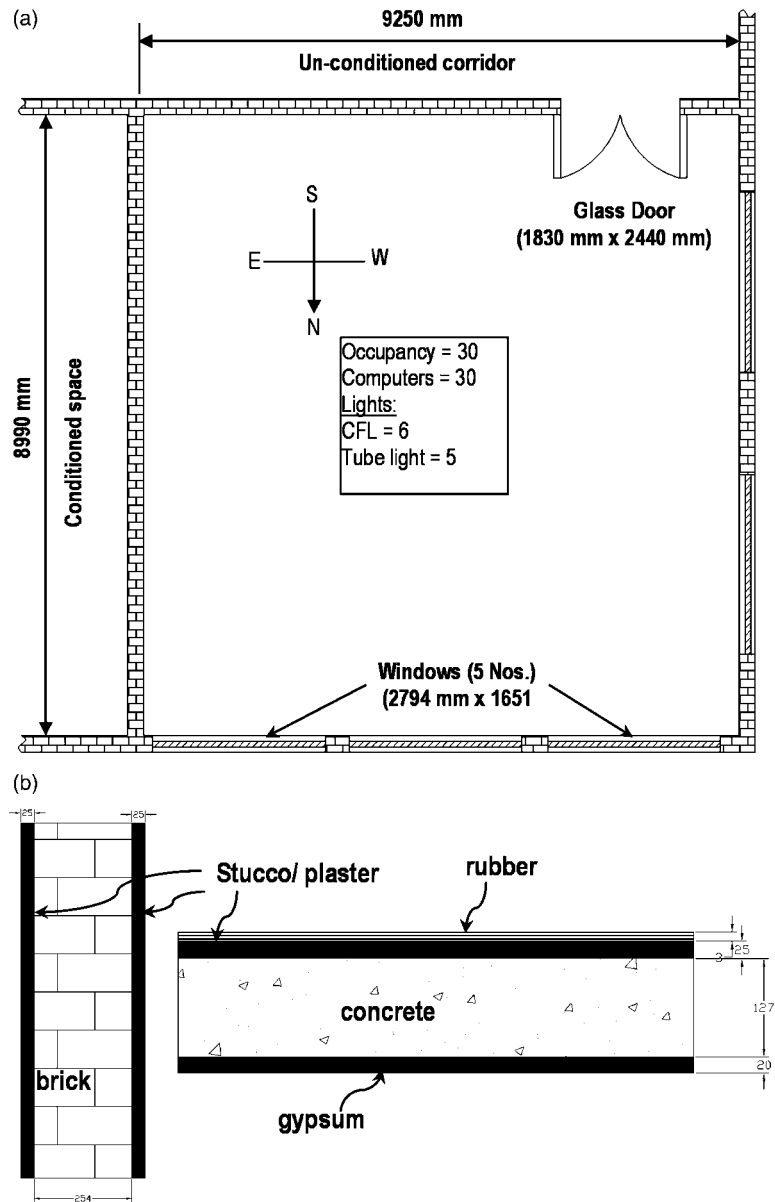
(a) Layout of CAD lab; (b) wall and roof cross-sections.
